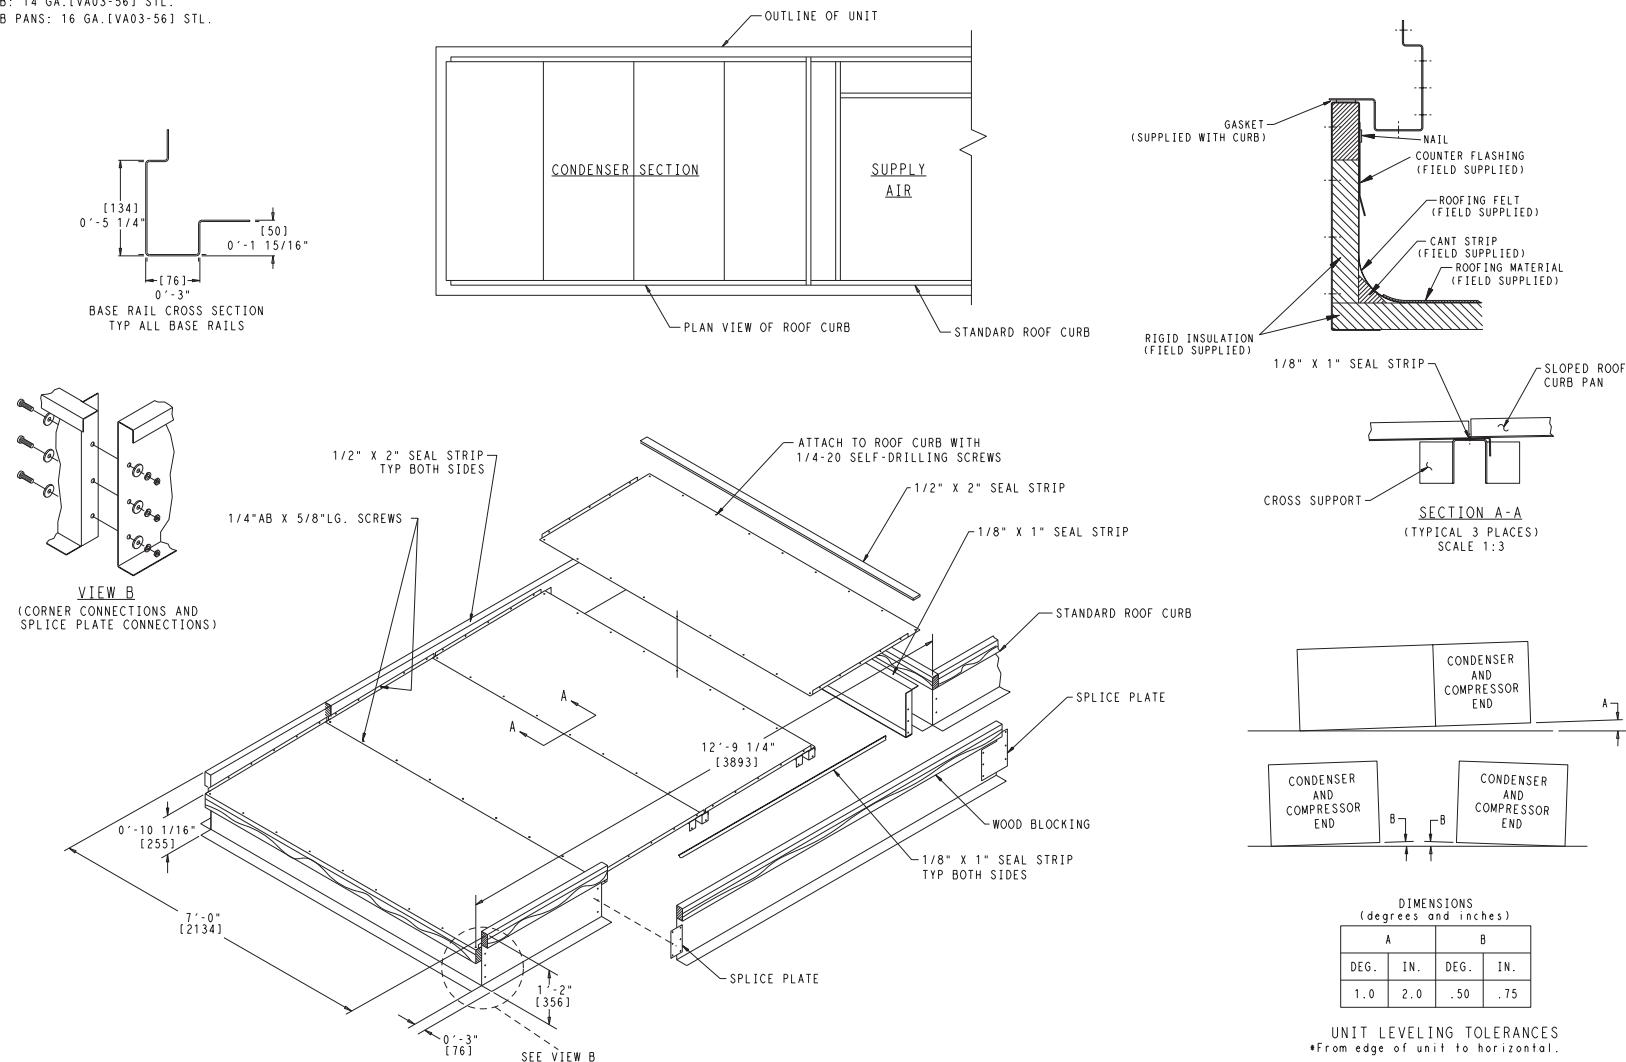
Condenser Section Roof Curb Assembly — CRRFCURB071A00 (Sizes 90 and 100)
